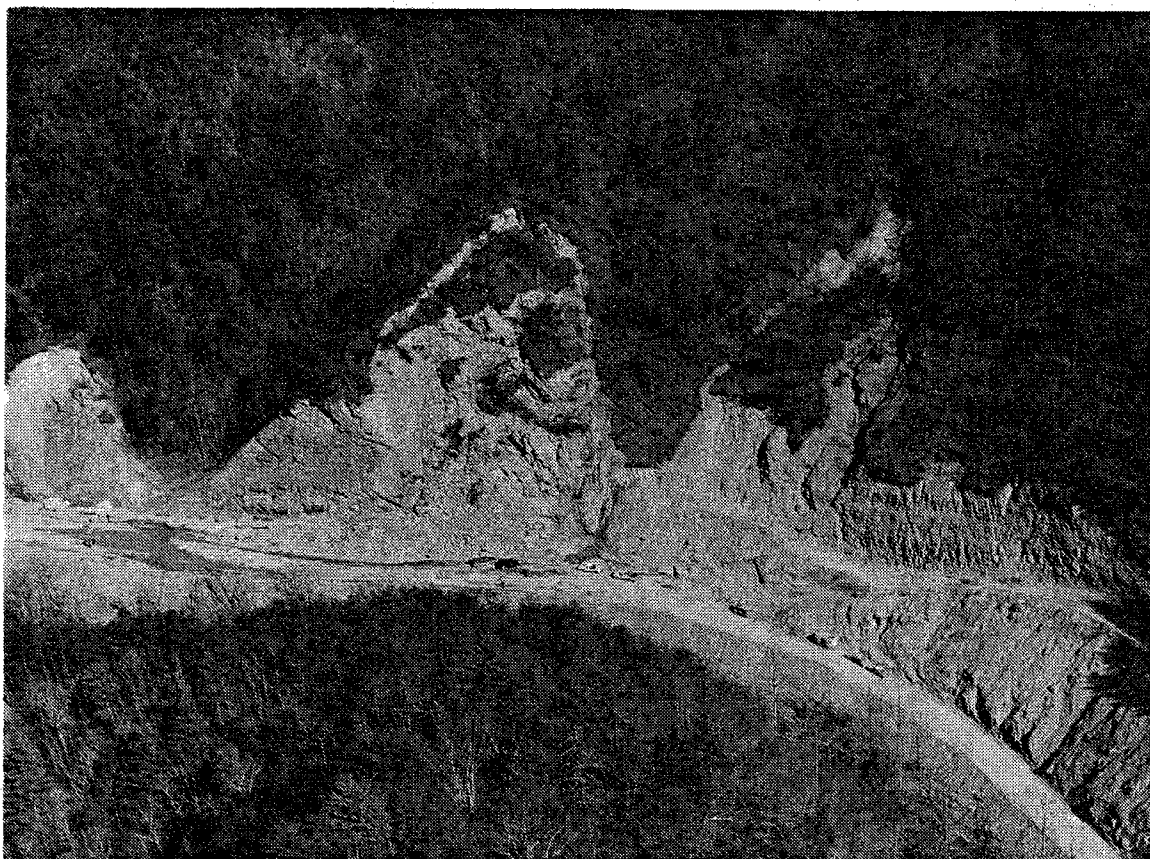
Translational slides (wedge failures) developed during construction of Secondary Route-2422 in Sevier County.
